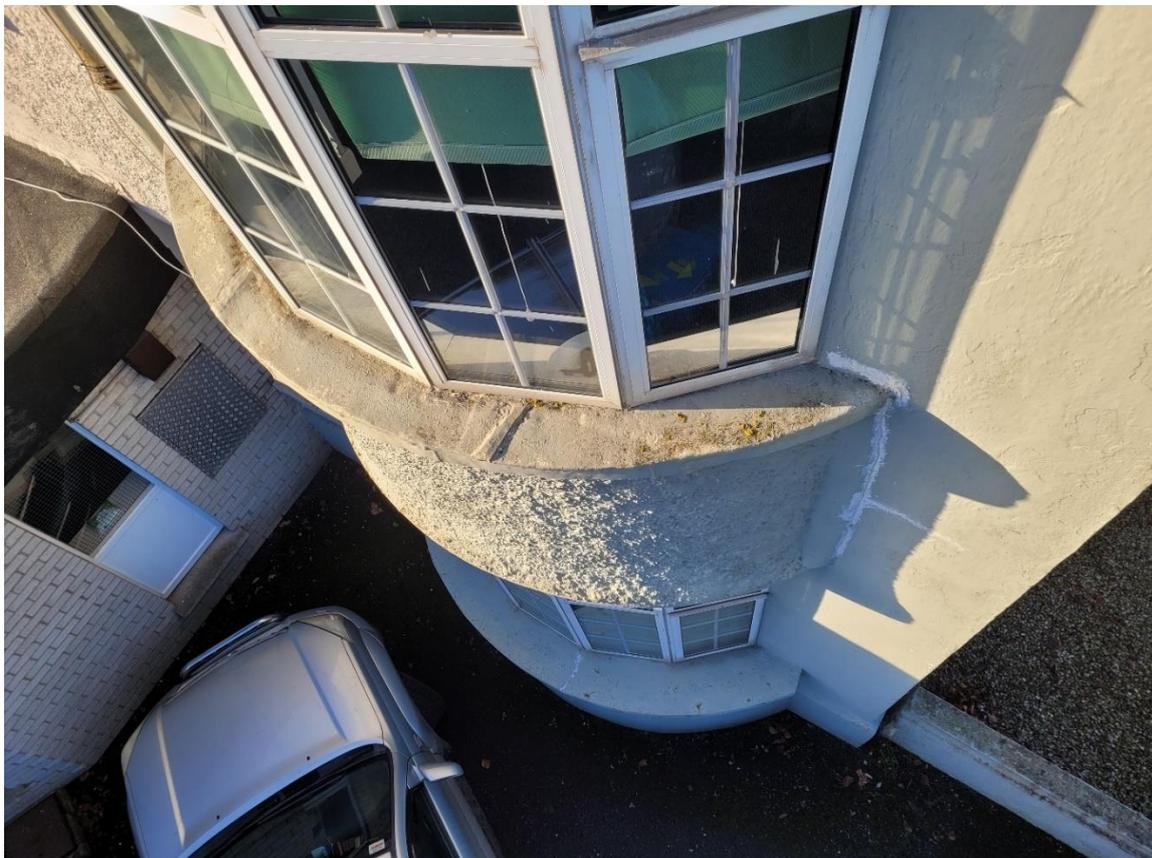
Showing the southeast bay from above. Note the lead flashing over the sill and the crack at the bay/main building junction.
